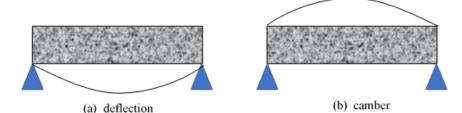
The camber of prestressed concrete (Hariandja, 2015)
